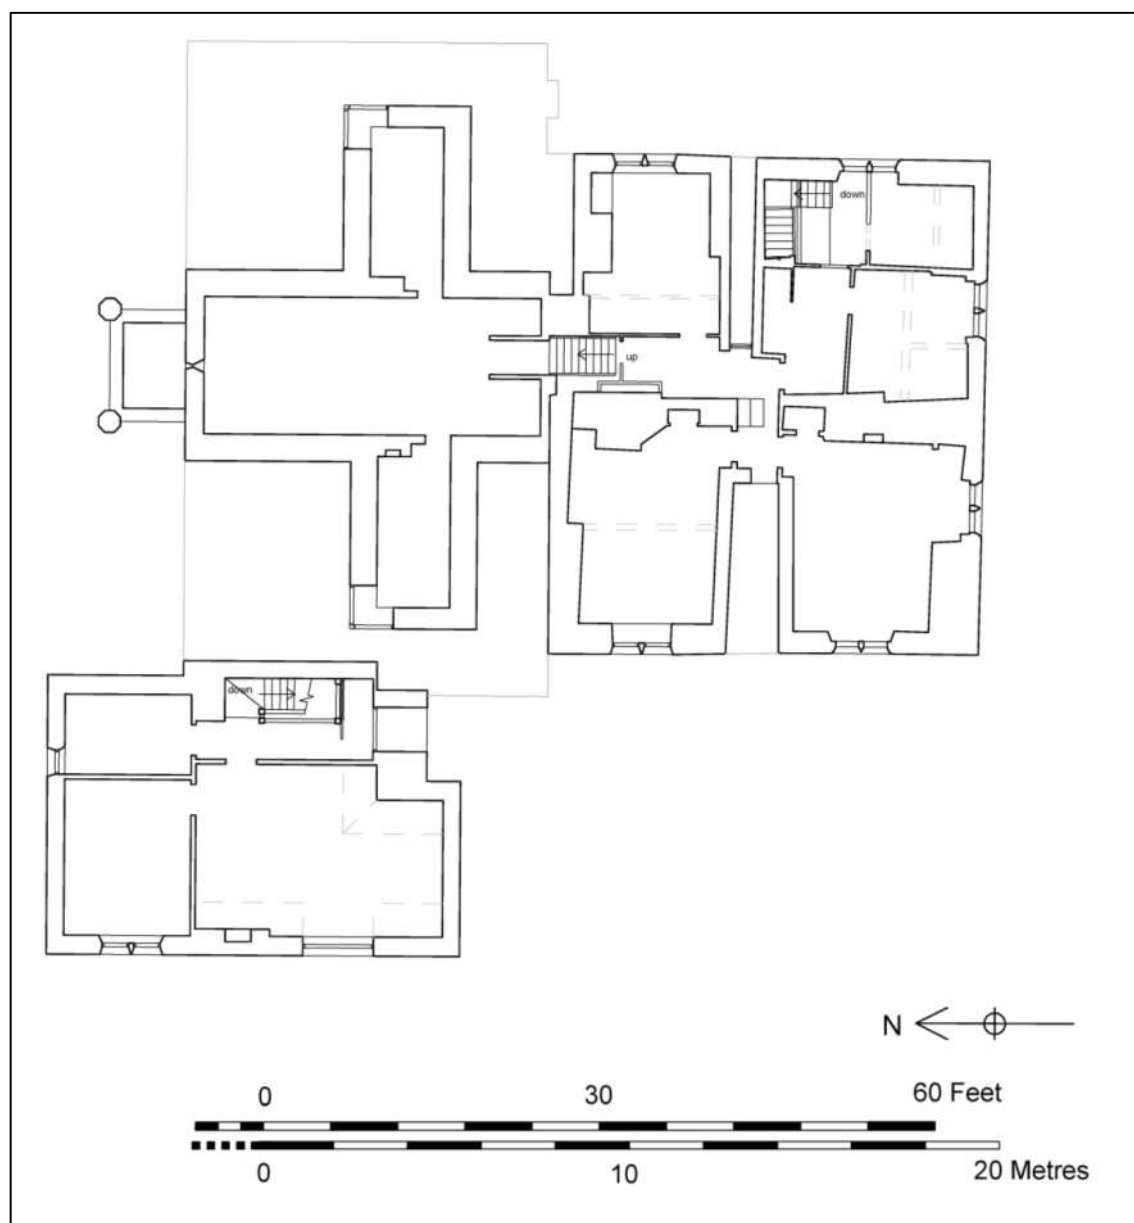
Existing second floor plan, derived from Nick Cox Architect survey drawing.
